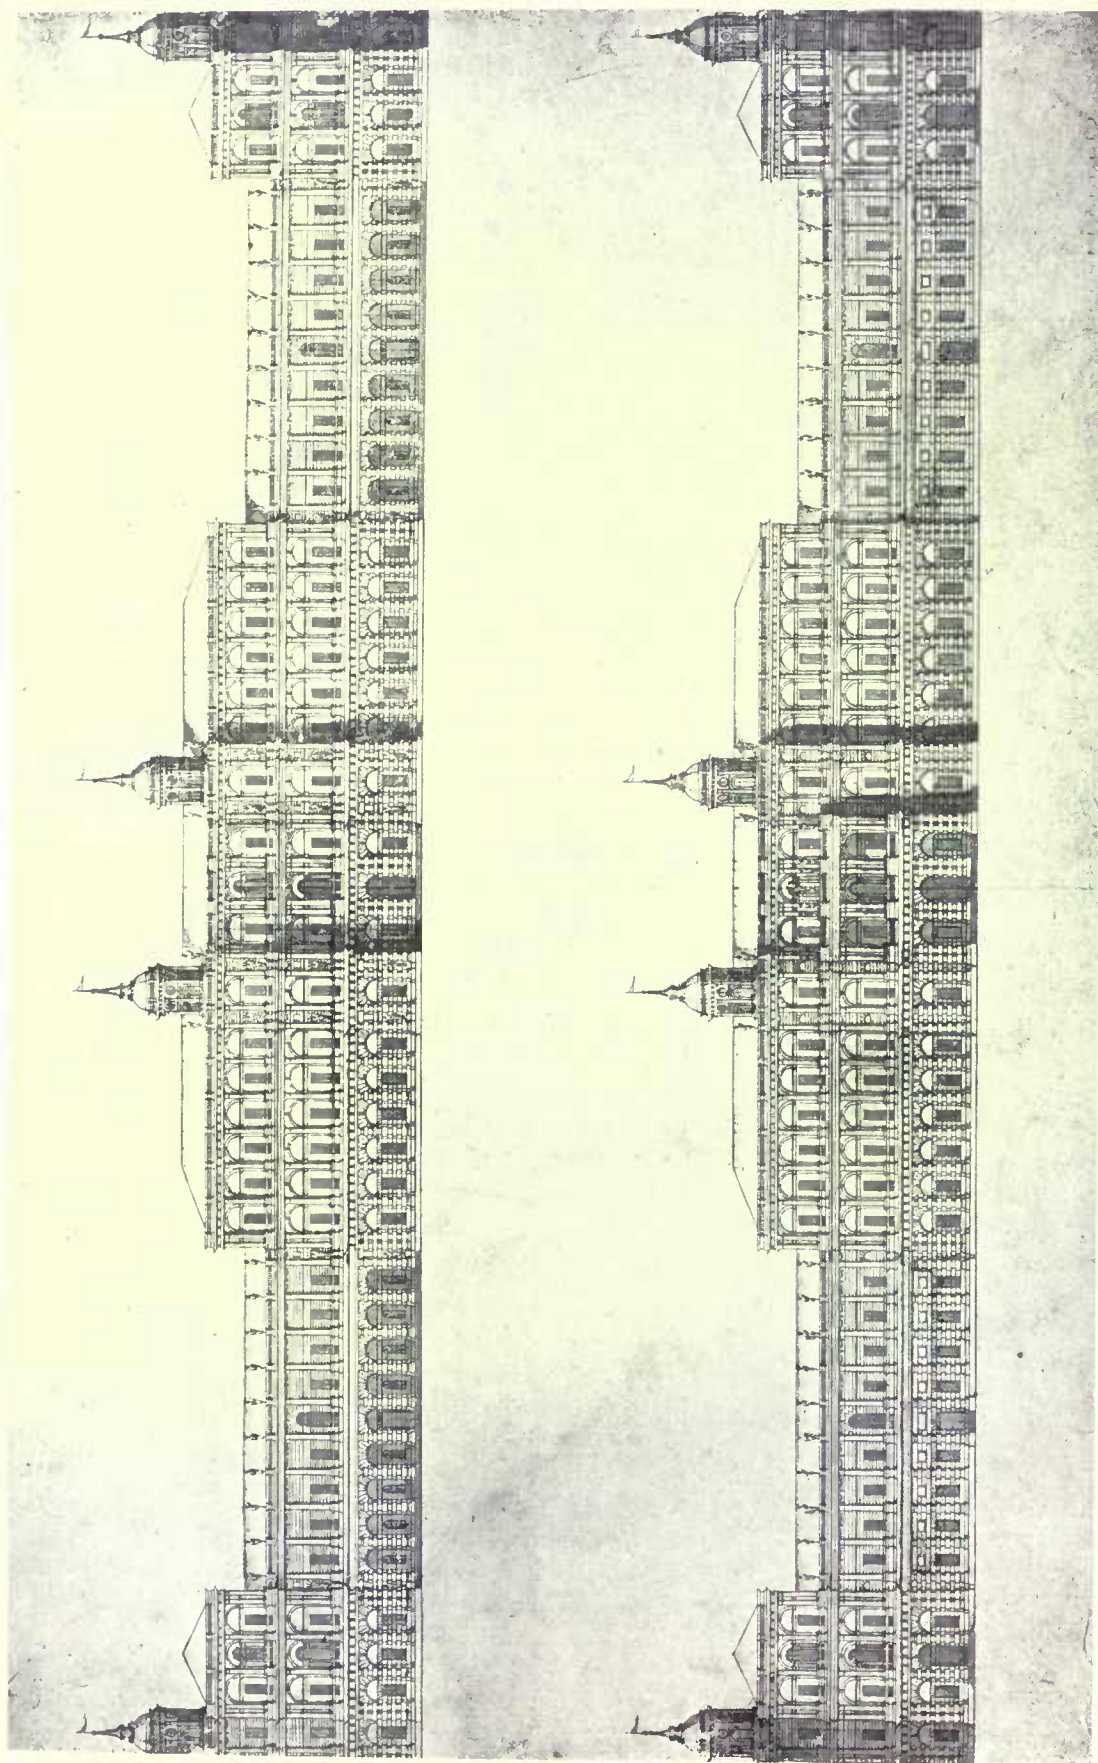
EAST AND WEST ELEVATIONS OF THE PLAN SHOWN BY FIG. 6
